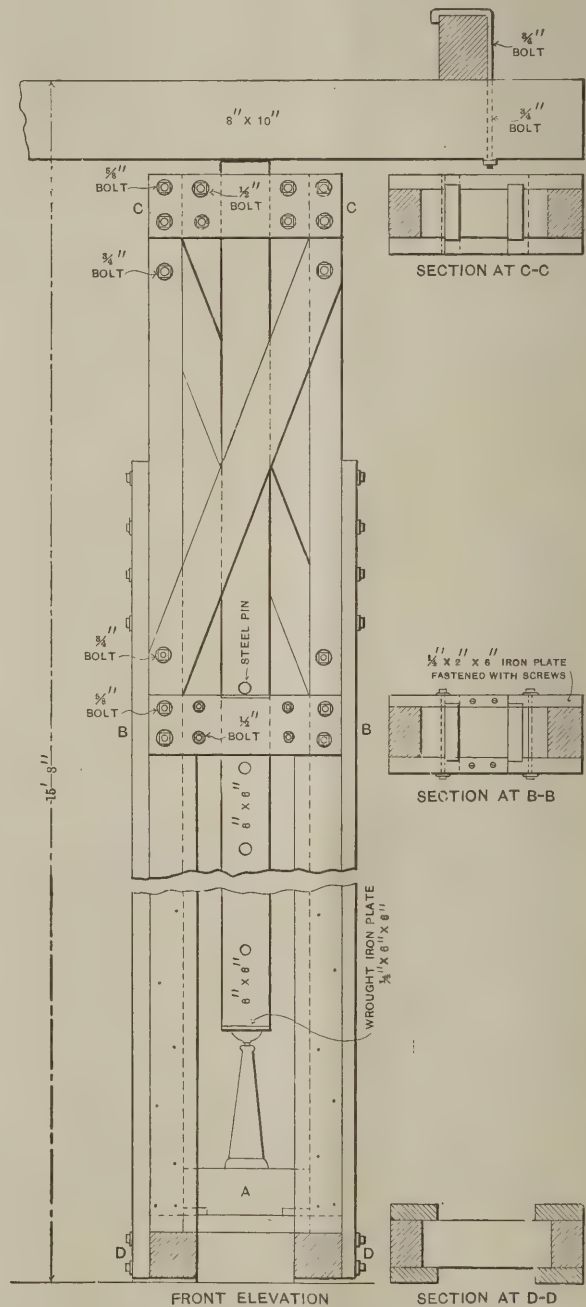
Elevations and Sections of Trestle, Showing Position of Jack-Screw and Vertical for Hoisting Purposes.
